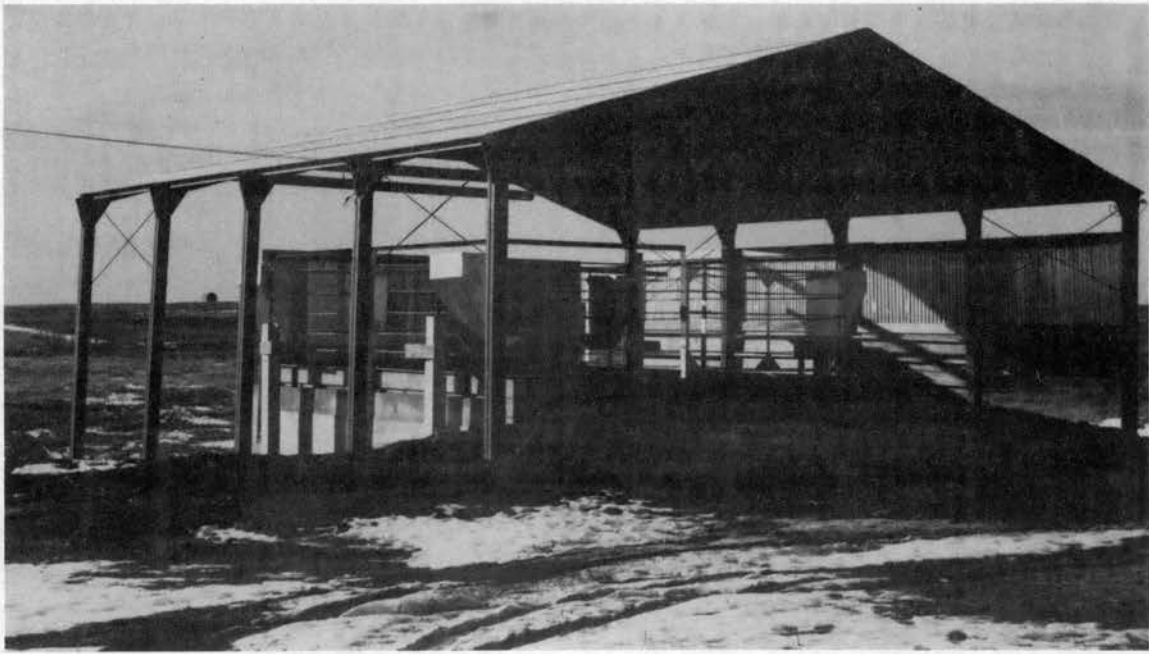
General View at Shelter Roof and Cage. Cage was completely floored with reinforced concrete precast grids.
